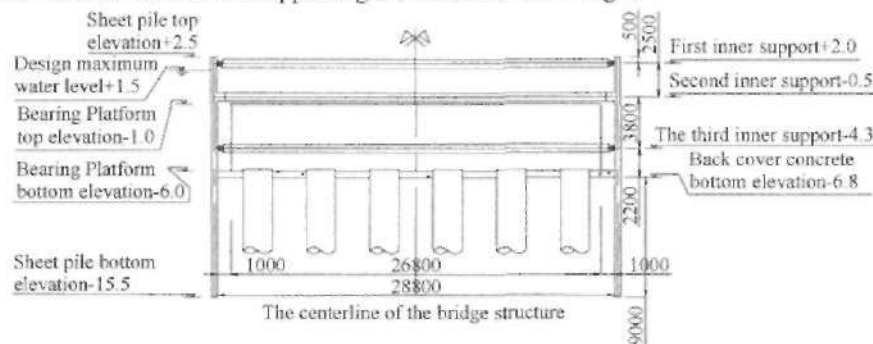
The elevation of the steel sheet pile cofferdam /mm
